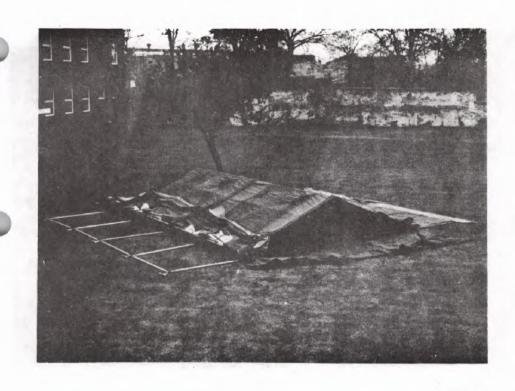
Lay storm lashings over the cover (one over each lacing join)
